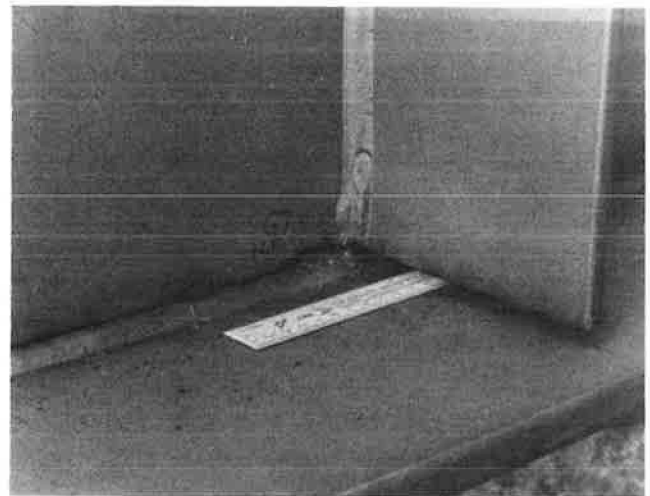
Cracking at a transverse stiffener web gap adjacent to a field splice.
